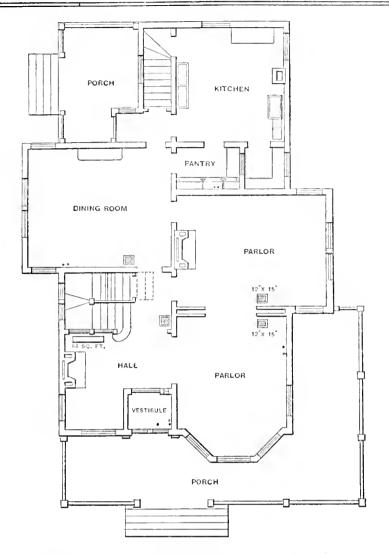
First-Floor Plan, Showing Registers and Hall Radiator.
